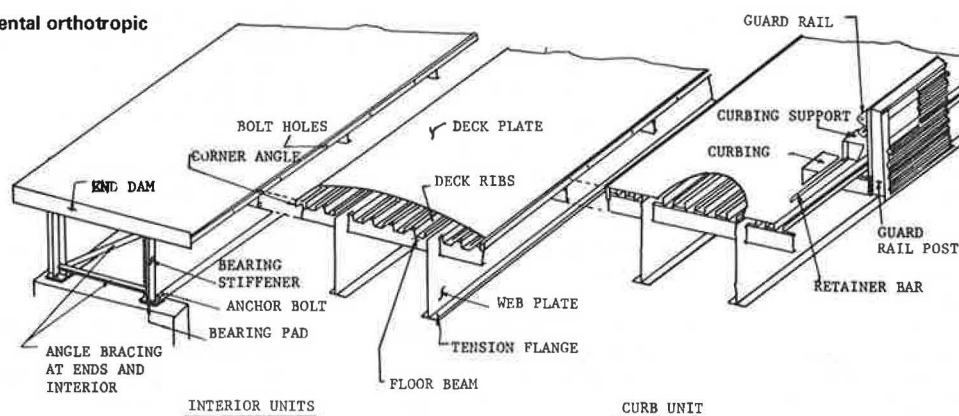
Deck section of continuous orthotropic steel plate deck bridge.
